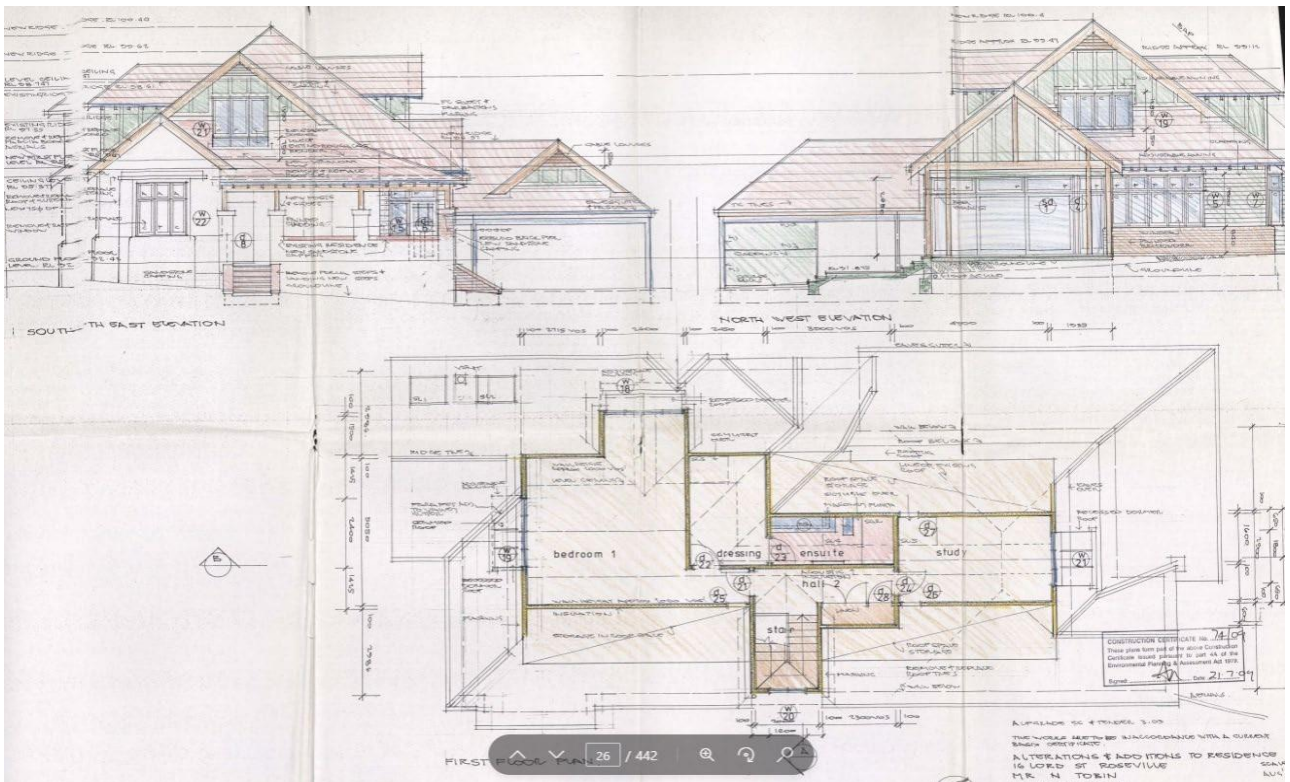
South-east elevation, north-west elevation and First Floor plan dated from 2009
